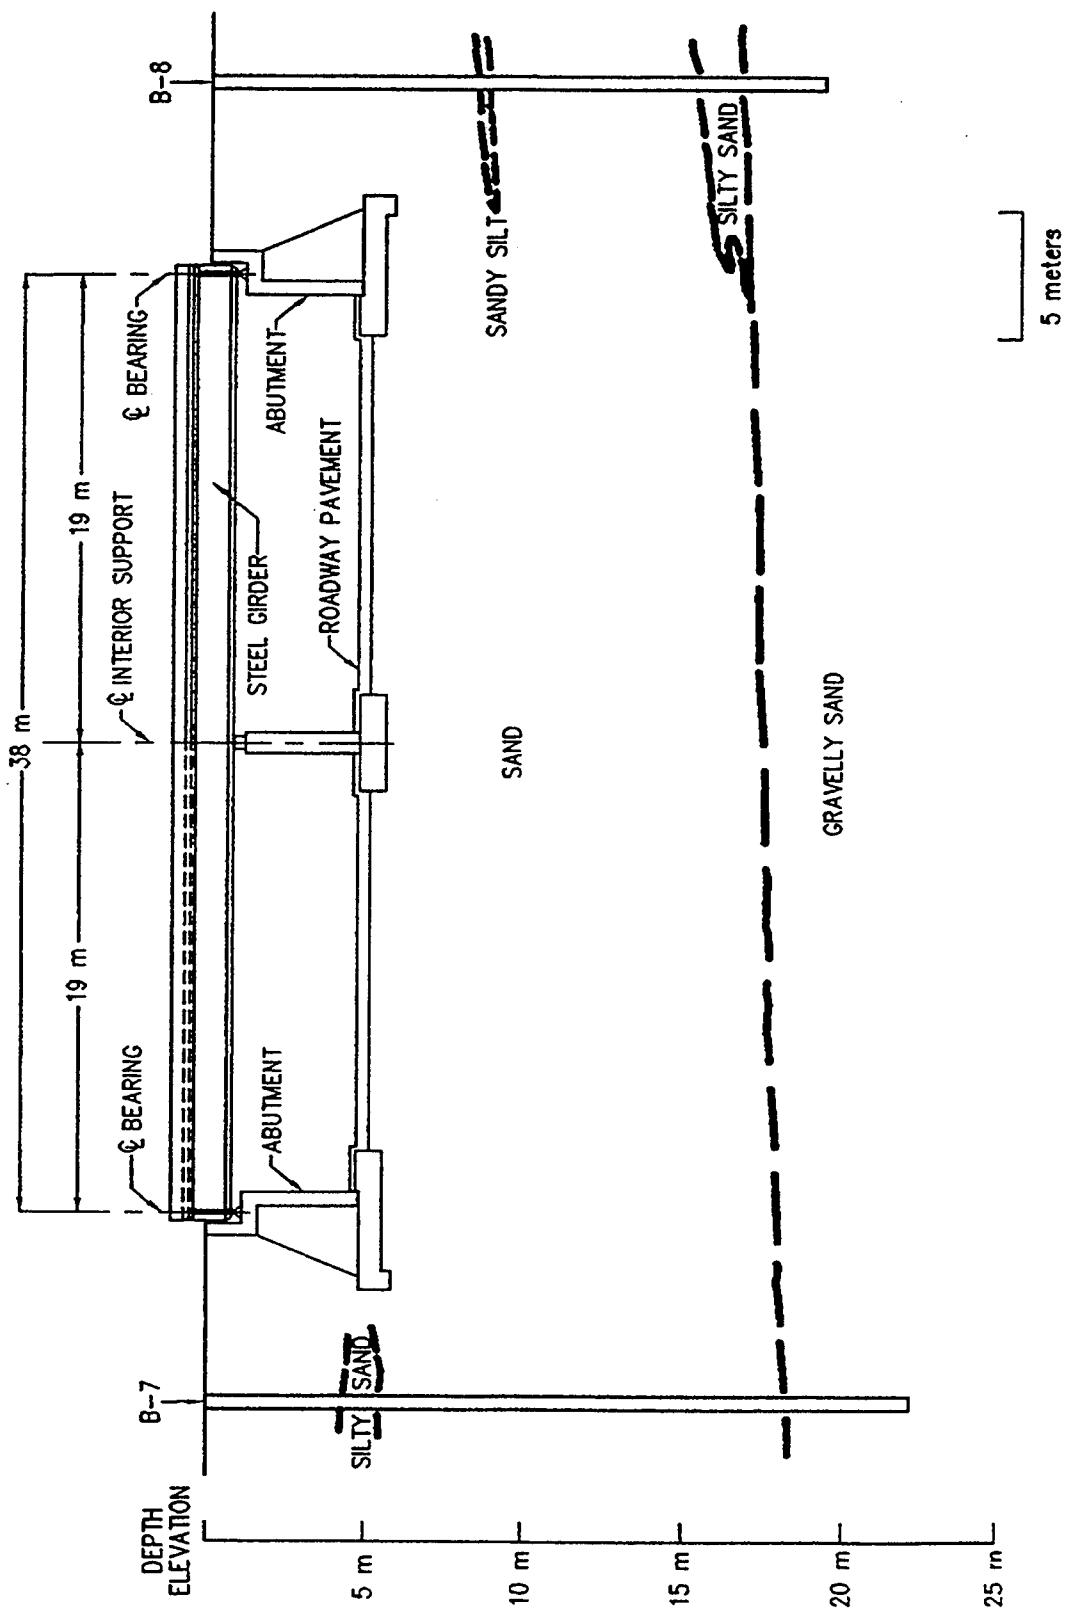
Cross Section of Proposed Bridge and Soil Stratigraphy.
